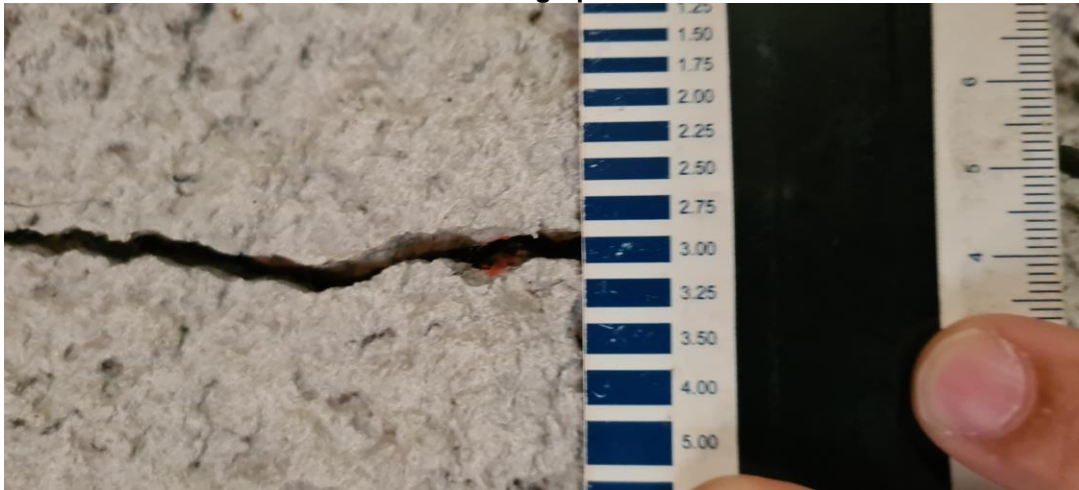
Horizontal cracks of up to 5mm were measured in the storeroom area
